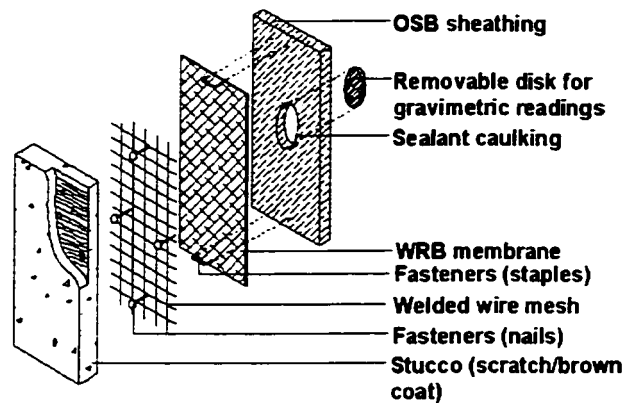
Components used in the fabrication of the stucco assemblies.
